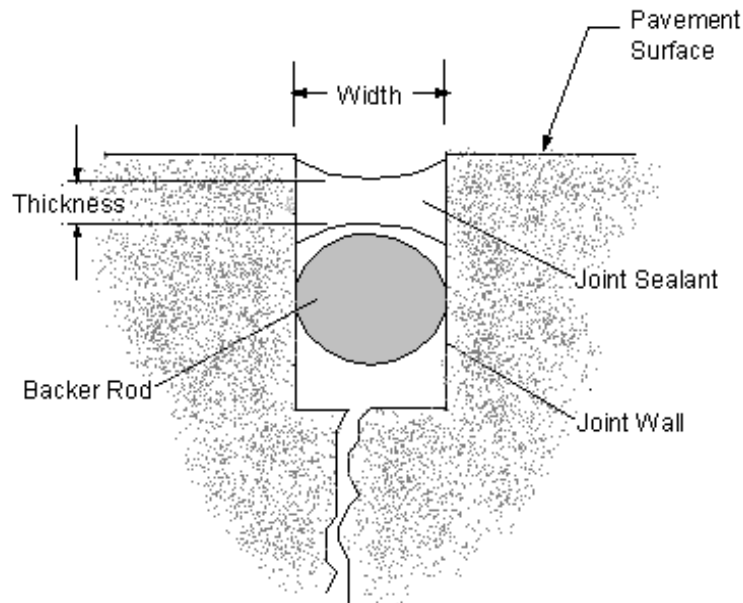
Typical concrete expansion joint using a field molded sealant
